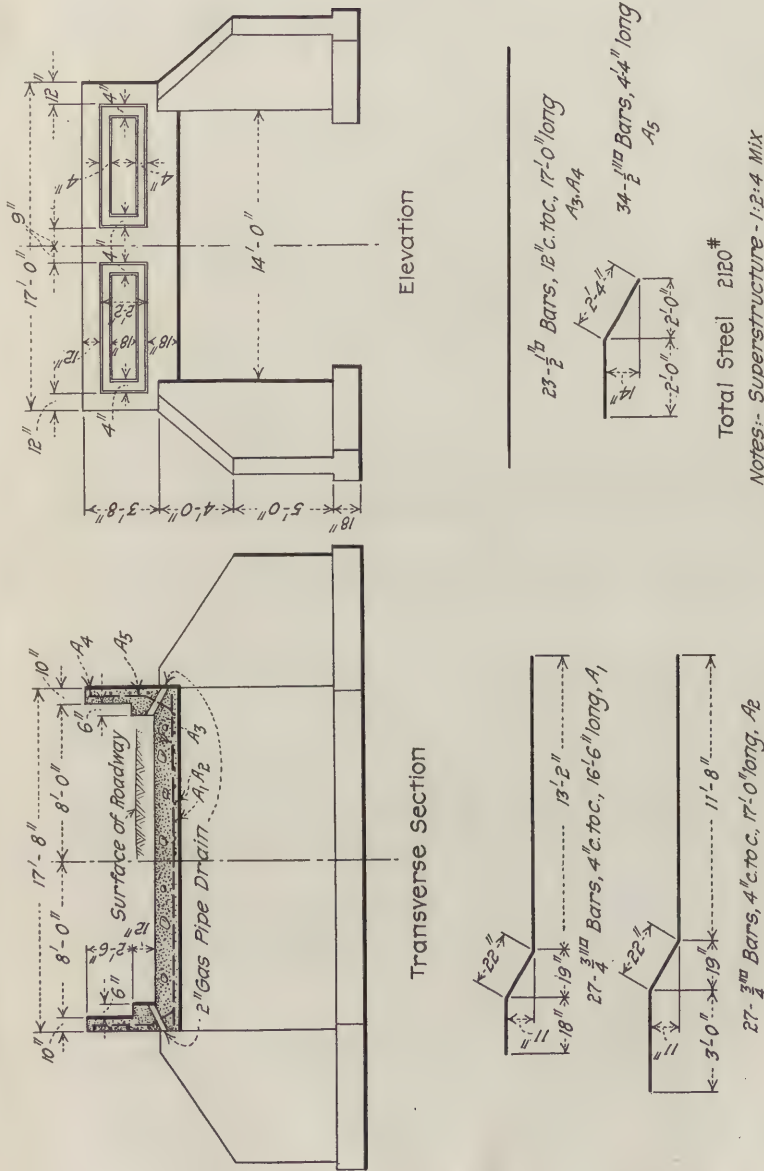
Concrete bridge of 14 ft. span and 16 ft. roadway. Designed by the Wisconsin State Highway Commission.
